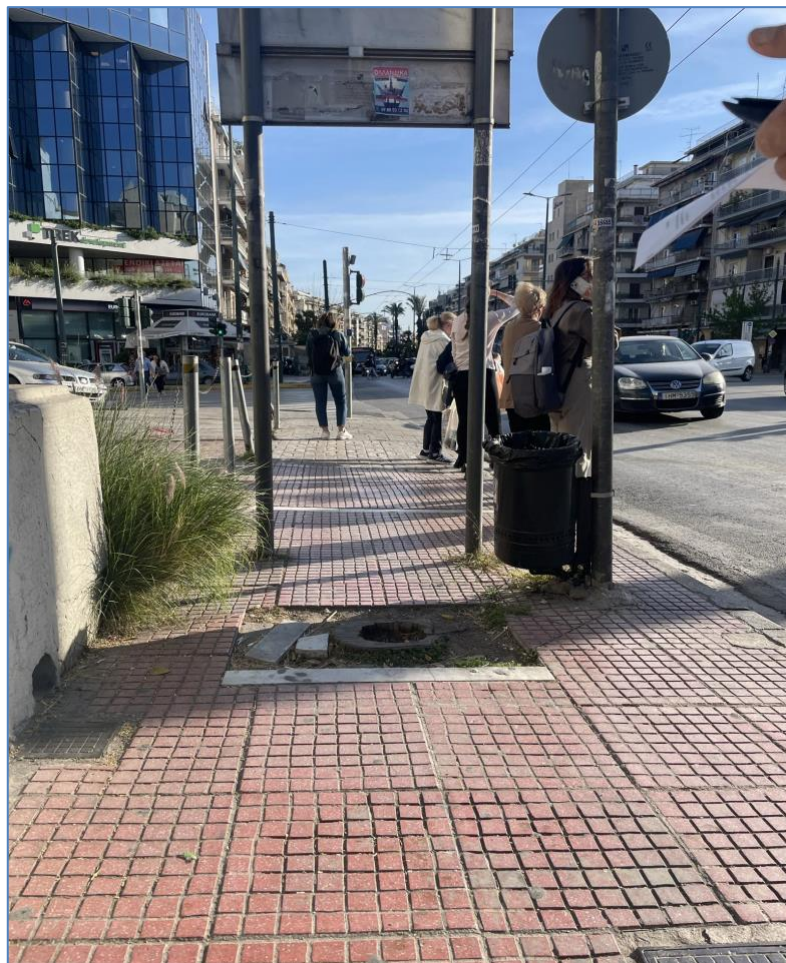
A destroyed sidewalk in the centre of Athens, a trash bin and a road sign
